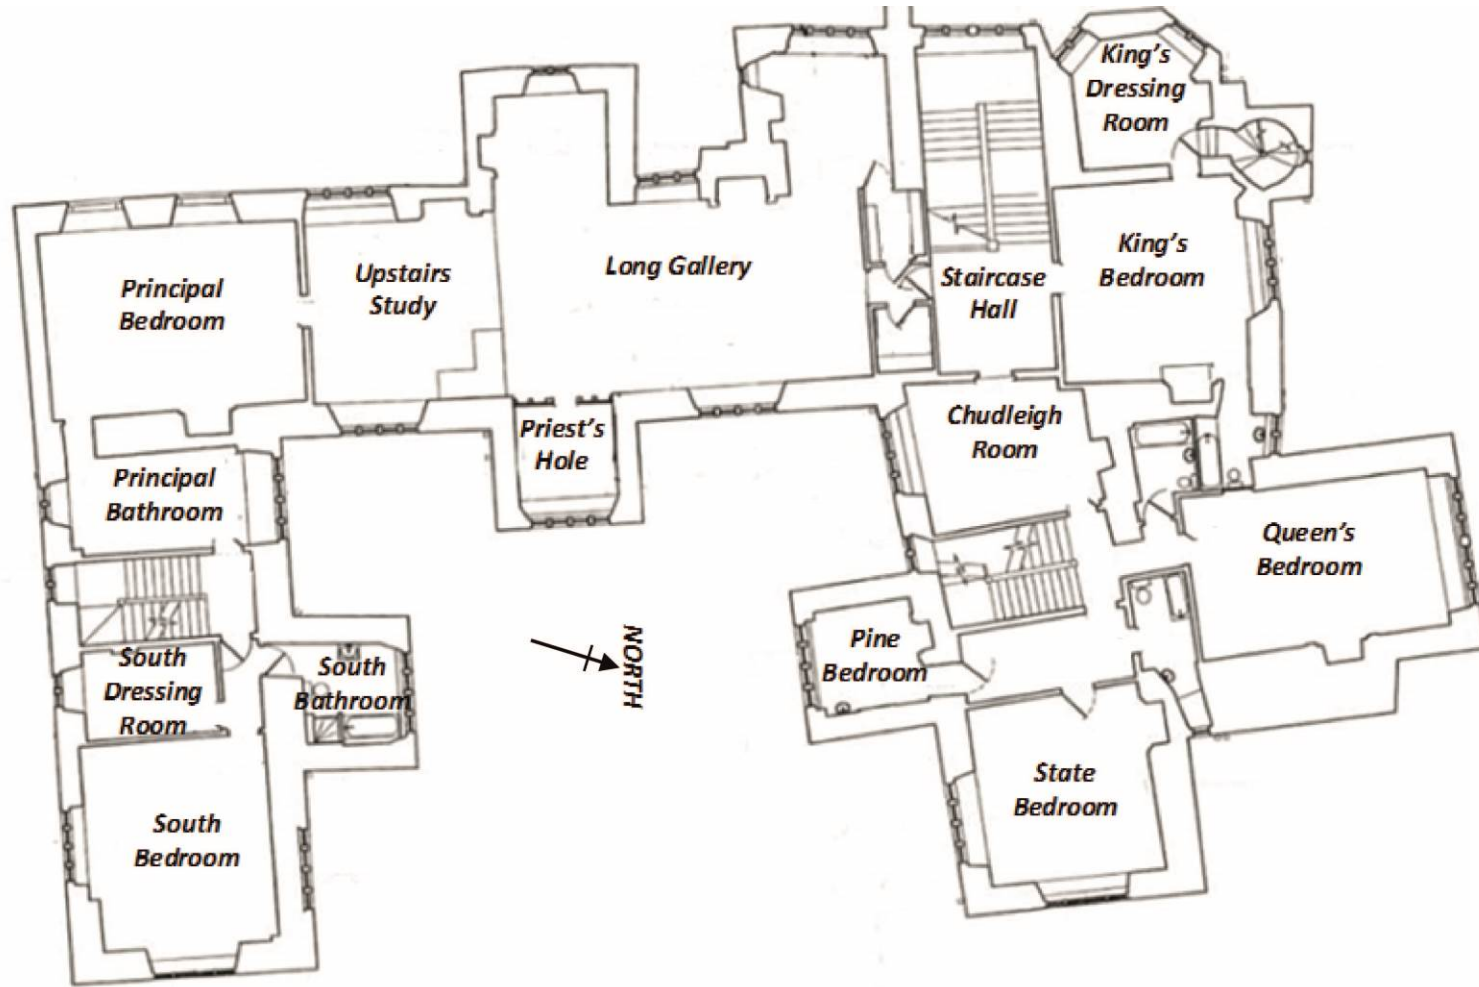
Plan at first-floor level with named rooms/areas (after Rodney Melville & Partners)
